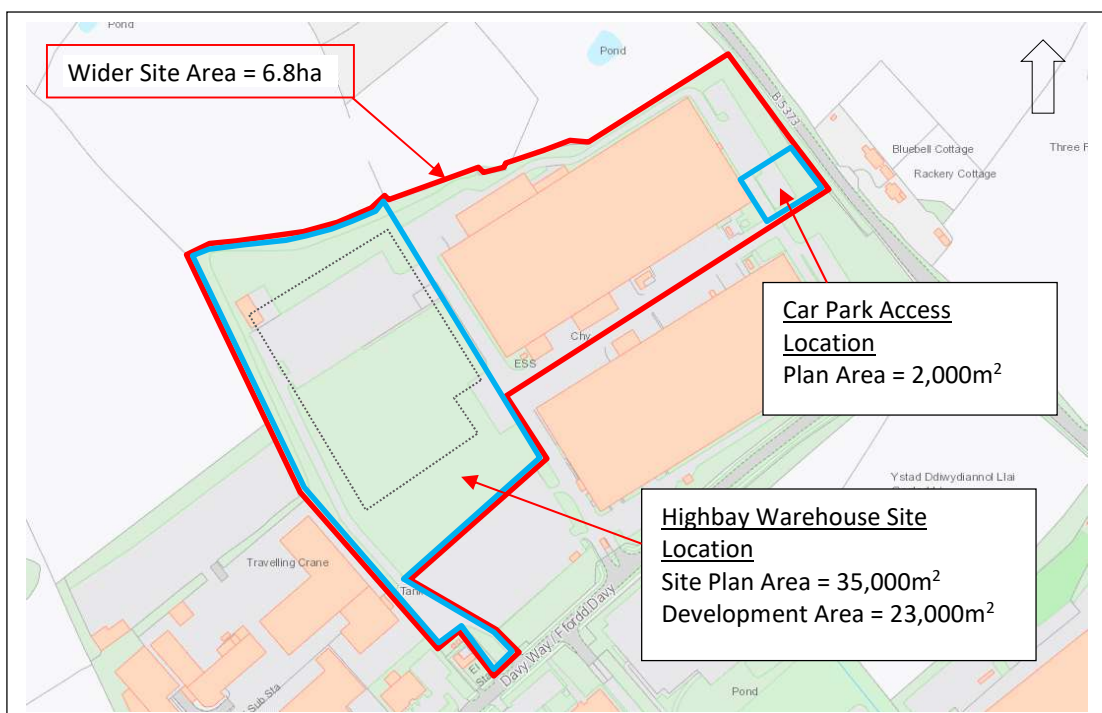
Site Layout Plan – Location and Plan Area of Proposed Development Sites
